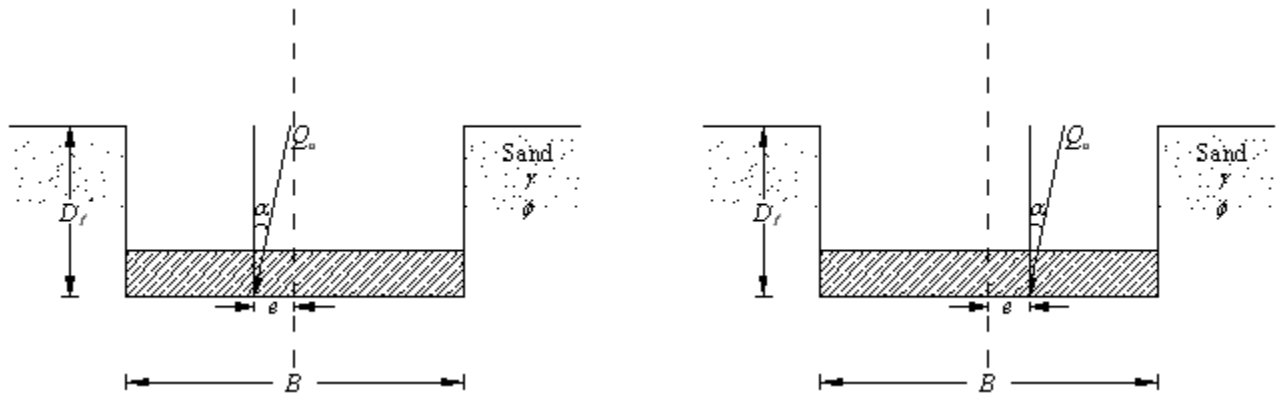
Eccentrically inclined load on a strip foundation: line of load application (a) towards the center line, and (b) away from the center line of the footing
